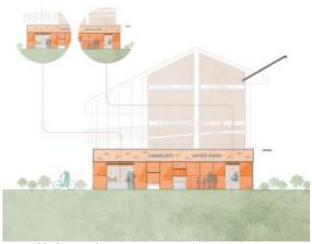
Outdoor Commercial Framing System Elevation Source: Author's Own (2024)
